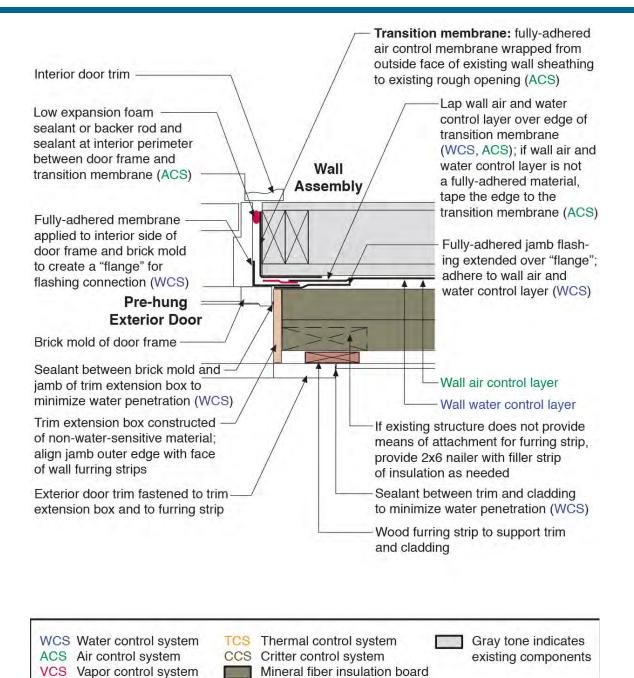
Schematic detail for door jamb of new door or reinstalled door in a high performance mineral fiber retrofit wall assembly
